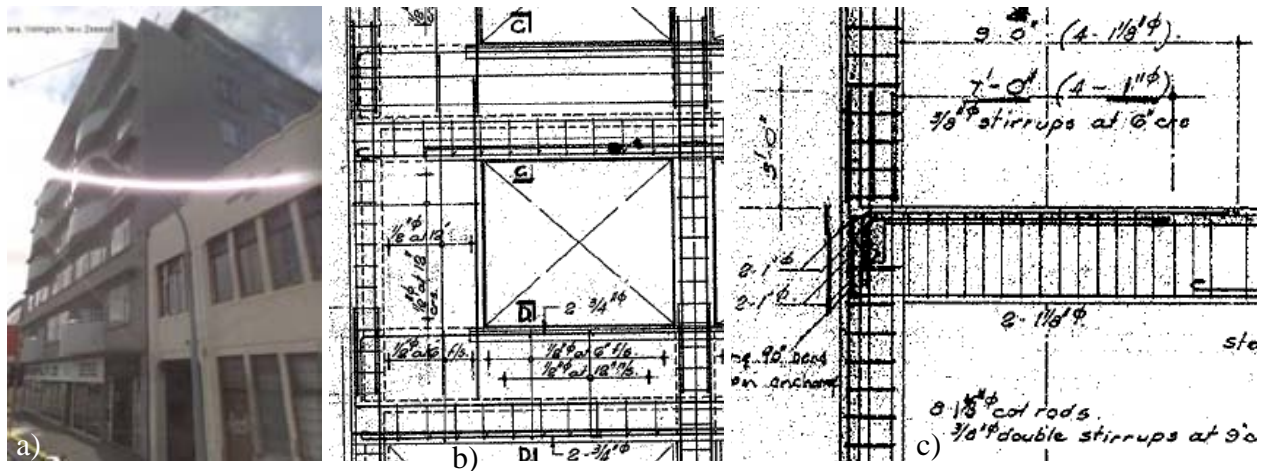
Case study building B: a) Front elevation frame and side elevation perforated RC walls; b) Beam-column joint and deep spandrel beam detailing of the front frame; c) Reinforcing detailing of the exterior beam-column joints within the internal frames.
